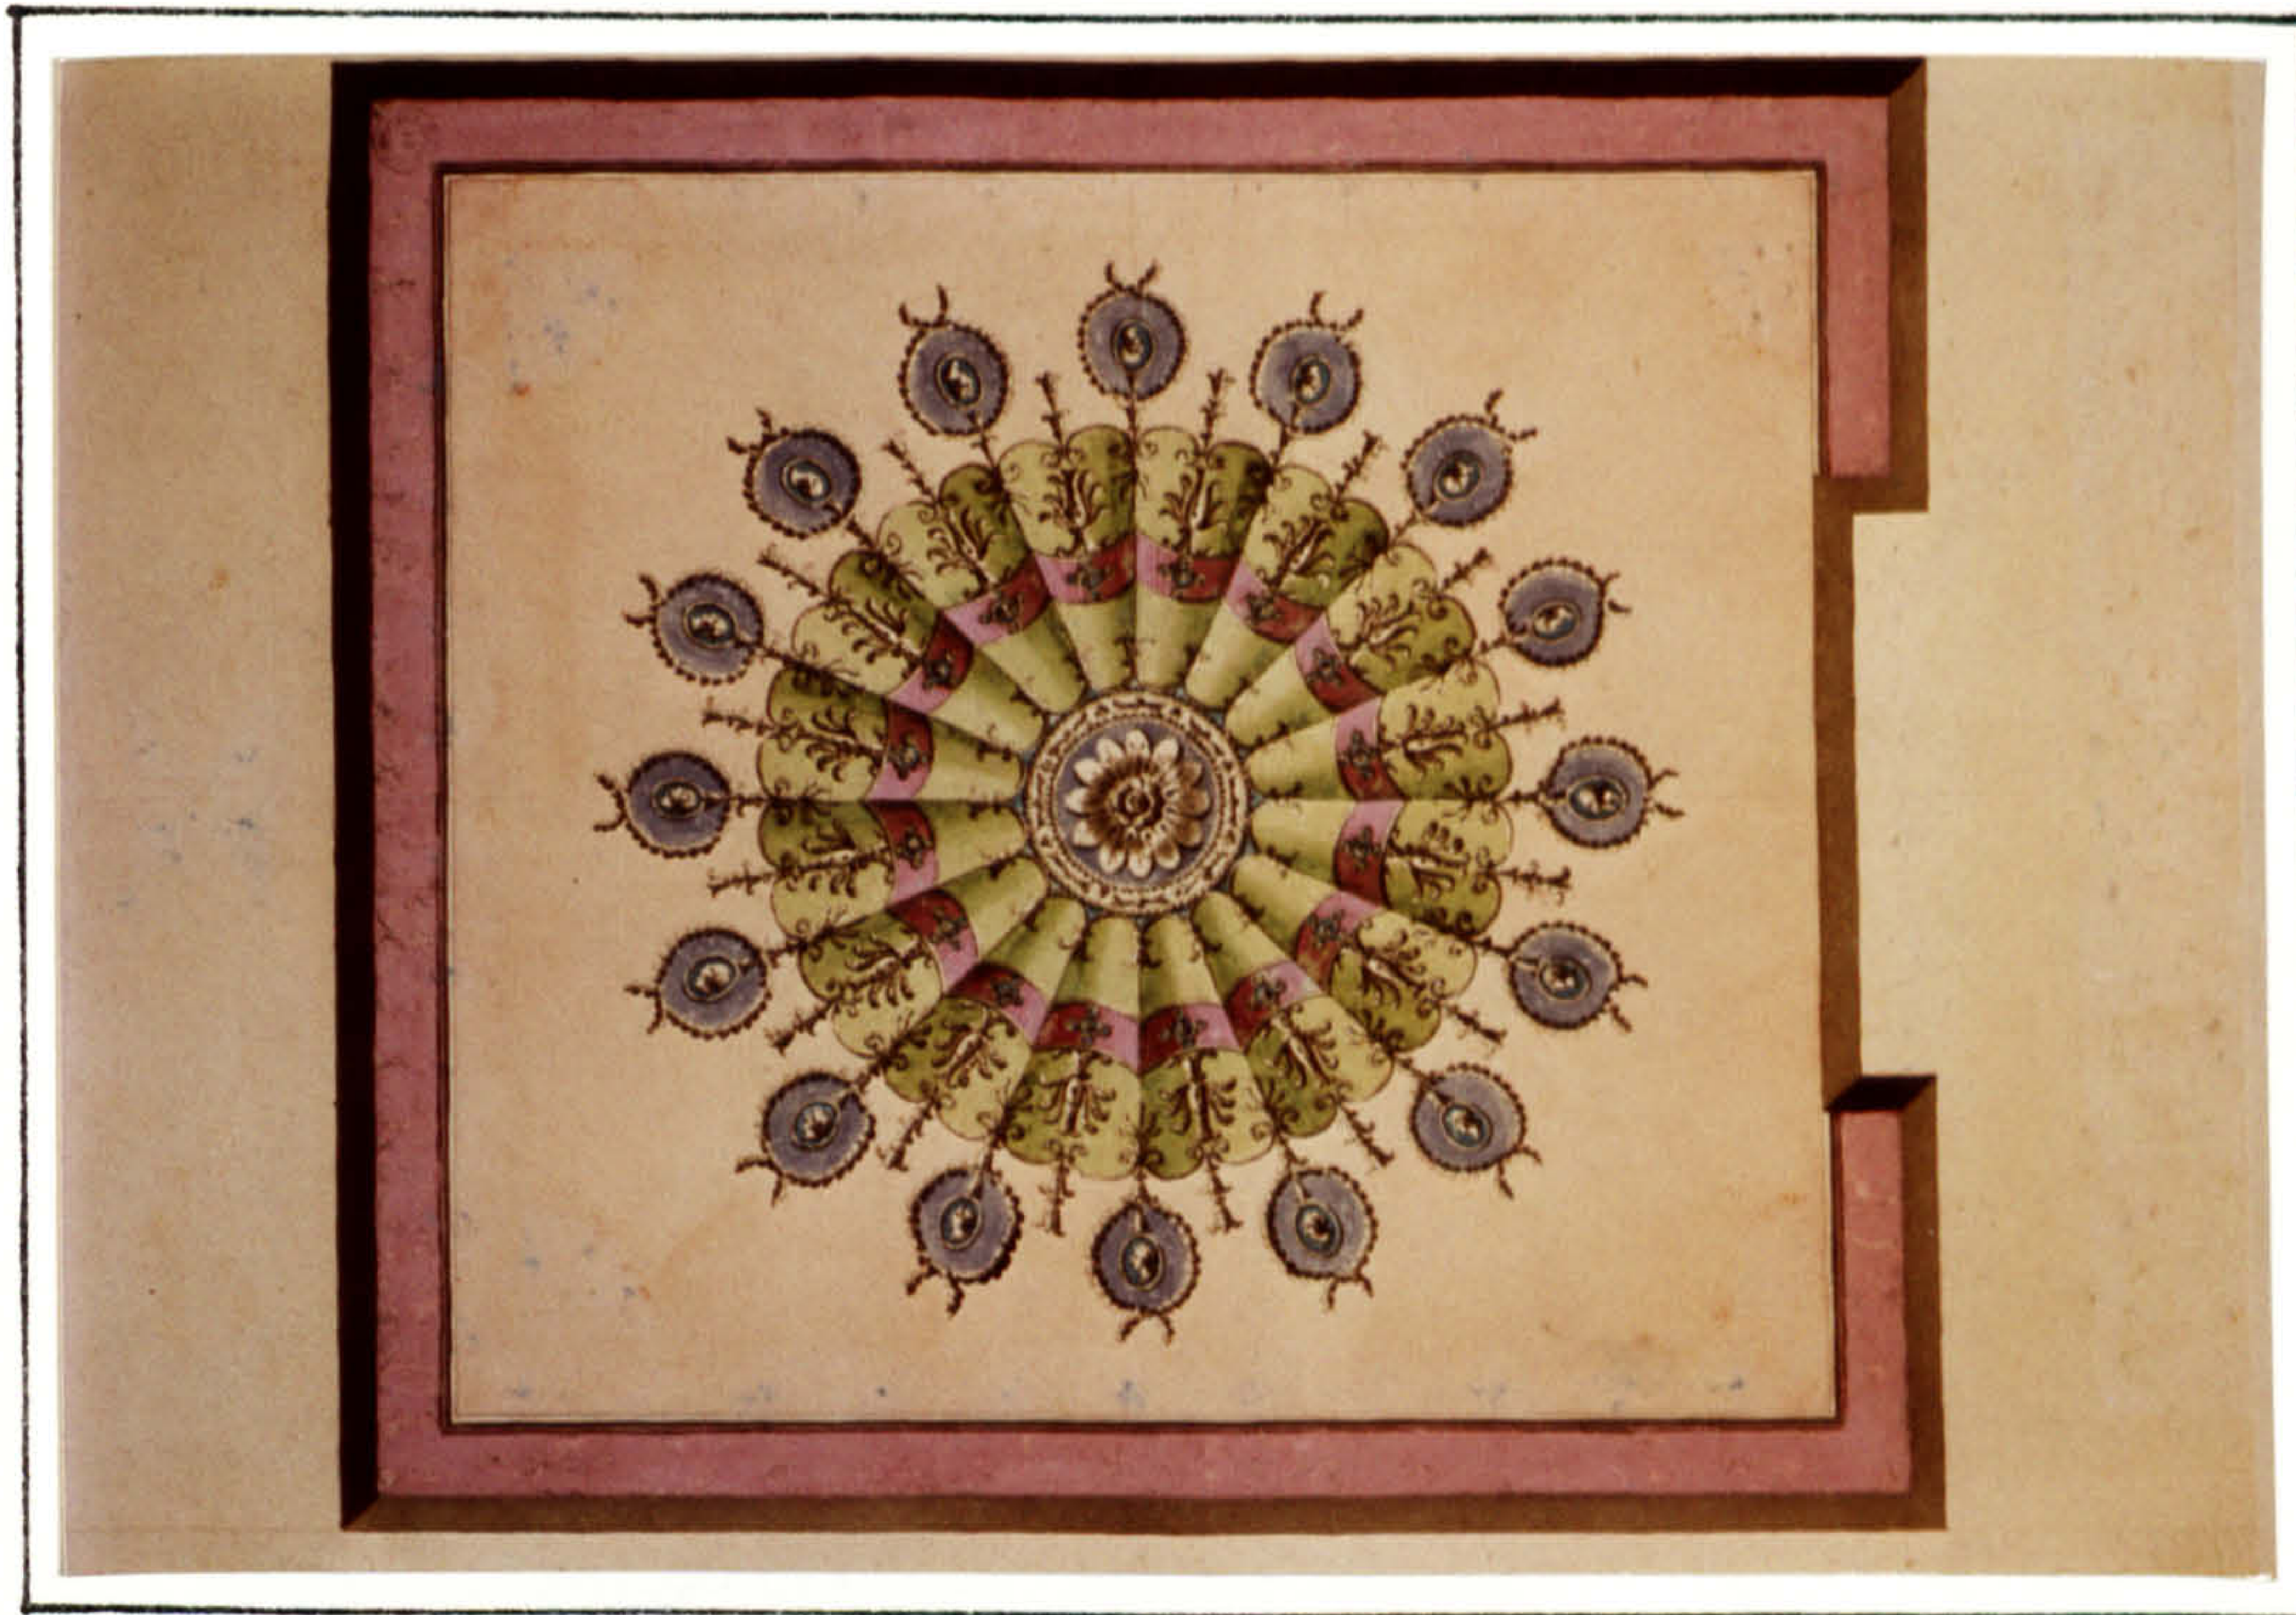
ROBERT ADAM · CEILING FOR LORD KERRY'S ANTE-ROOM IN
